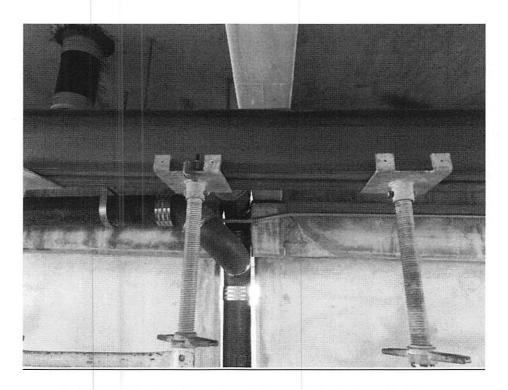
Cracked Haunch and Shored Joist below third floor.
